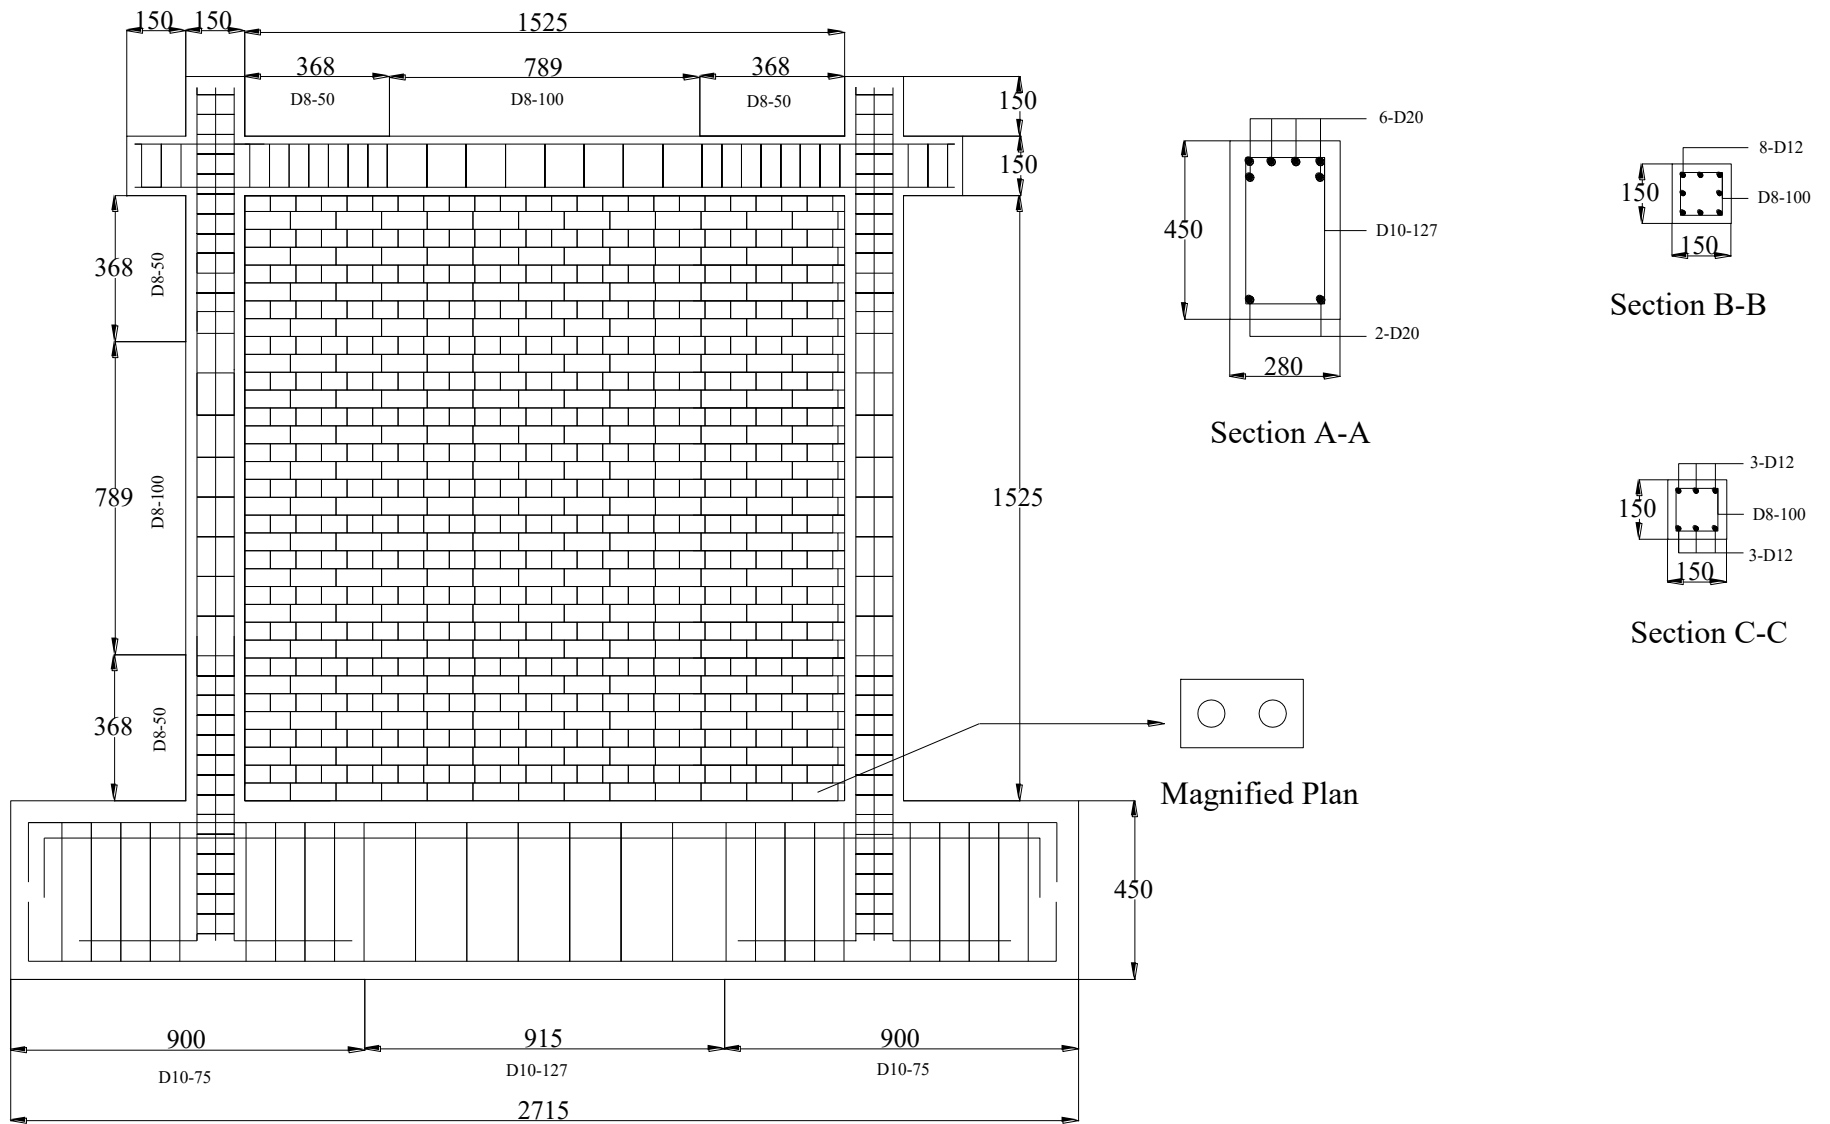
Schematic drawing of PB (Every unit is in mm) [Note: Section A-A, B-B and C-C are the midsection of base, column and beam respectively].
